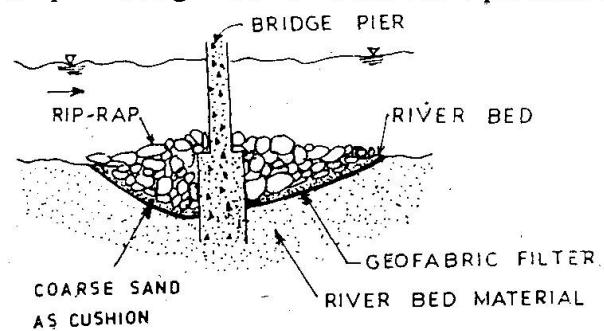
SCOUR PROTECTION FOR A BRIDGE PIER
